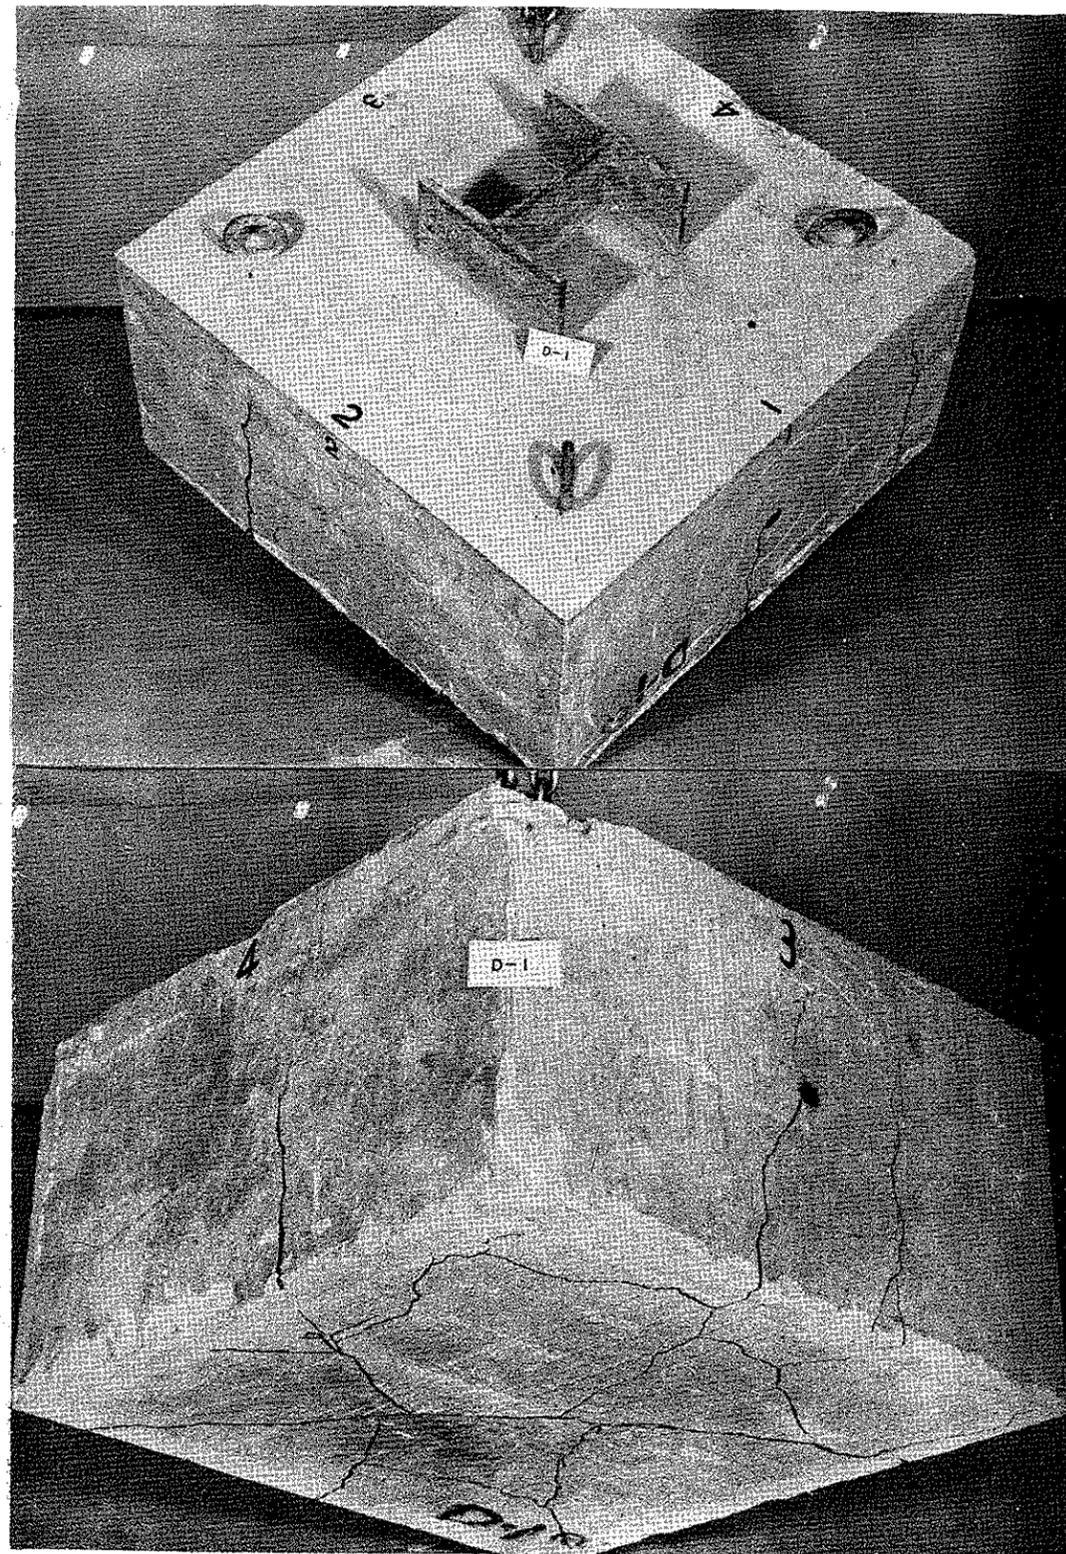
APPEARANCE OF SPECIMEN D-1 AFTER TESTING.
